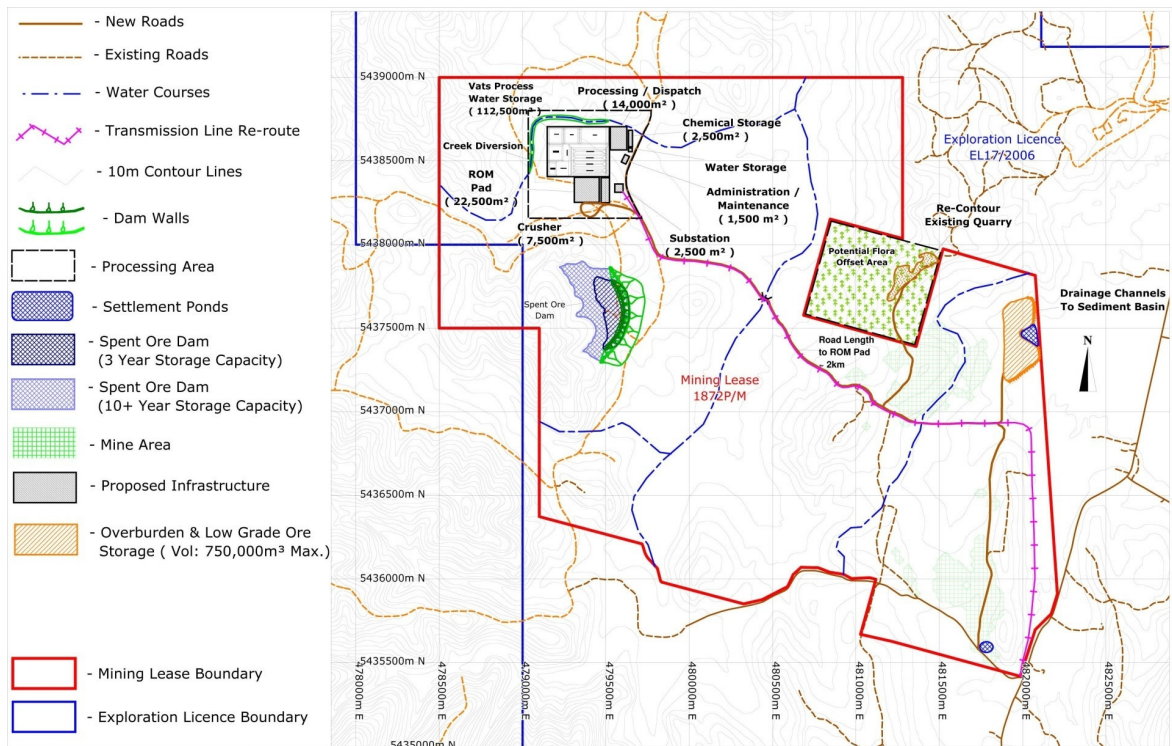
Updated Proposed Layout of the Barnes Hill Mine and Processing Facility.
